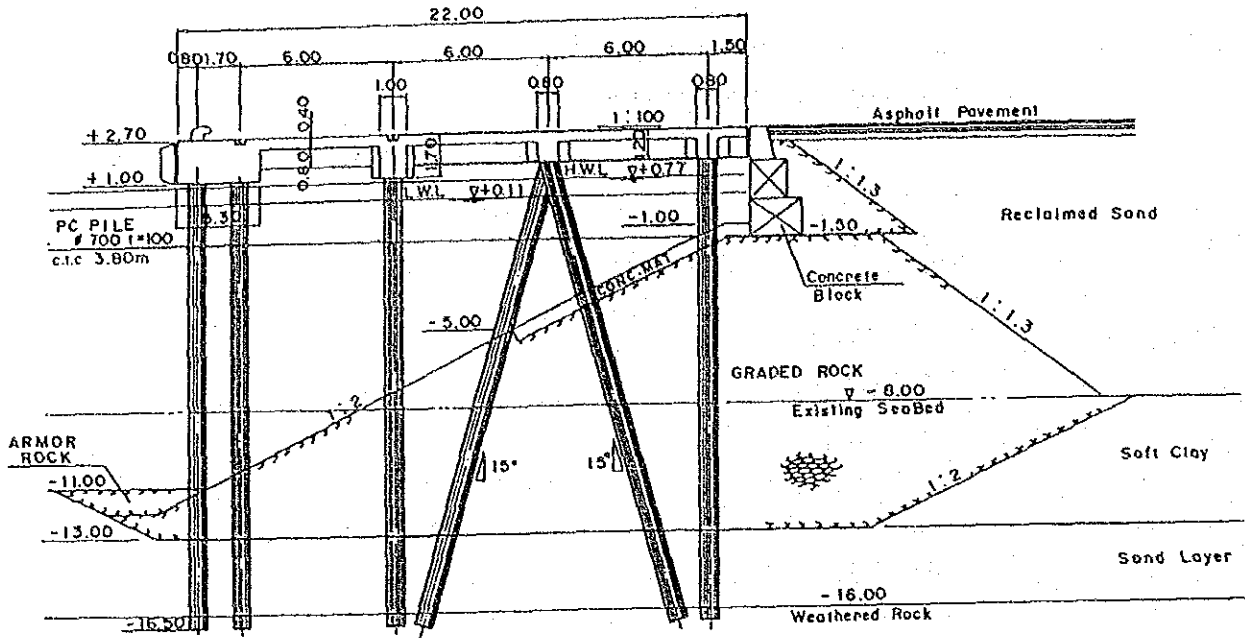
Typical Cross Section of North Pier No. 3 Berth
